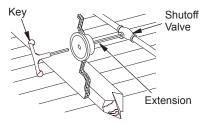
Typical Exterior Wall Gas Shutoff Installation
